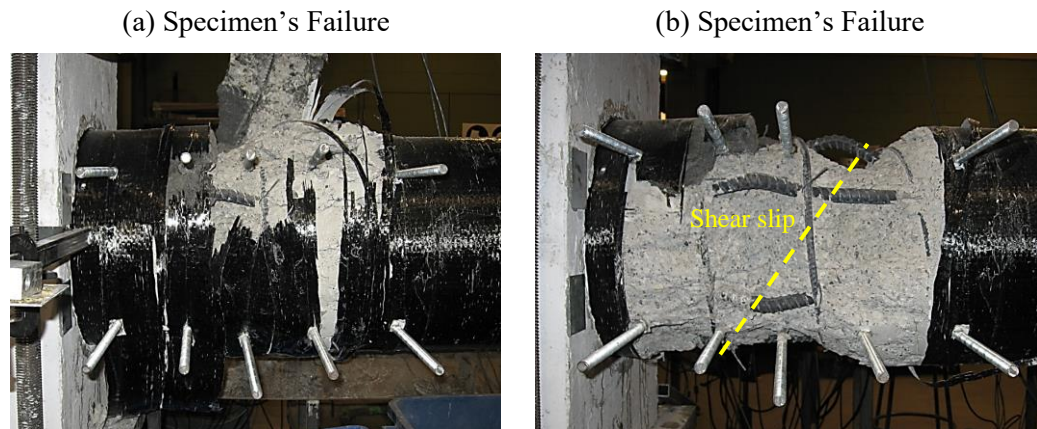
Damage developed on the retrofitted Specimen #3 after the quasi-static lateral testing under moderate constant axial load (Test 3.3).
